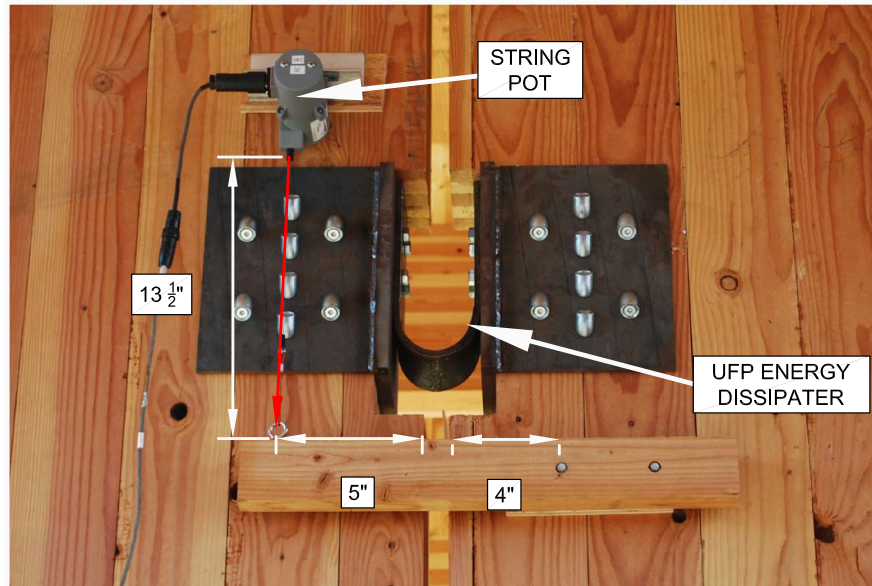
Typical layout of string pots measuring deformation of the UFPs
